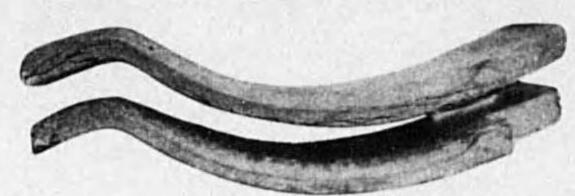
Specimen of roofing tiles after freezing and thawing test, showing the side view.
